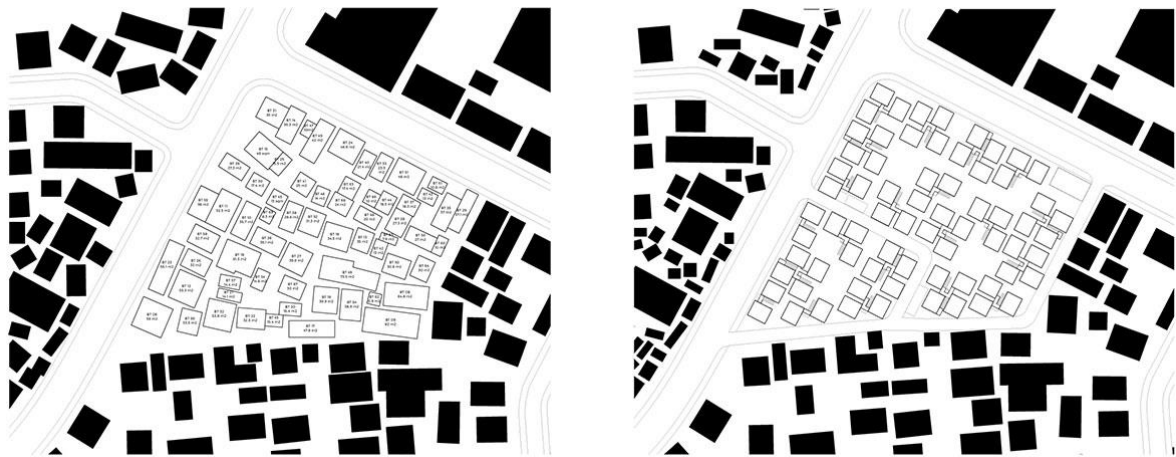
Left: Plan showing existing informal settlement. Right: Upgrade plan/re-blocking possibility.
